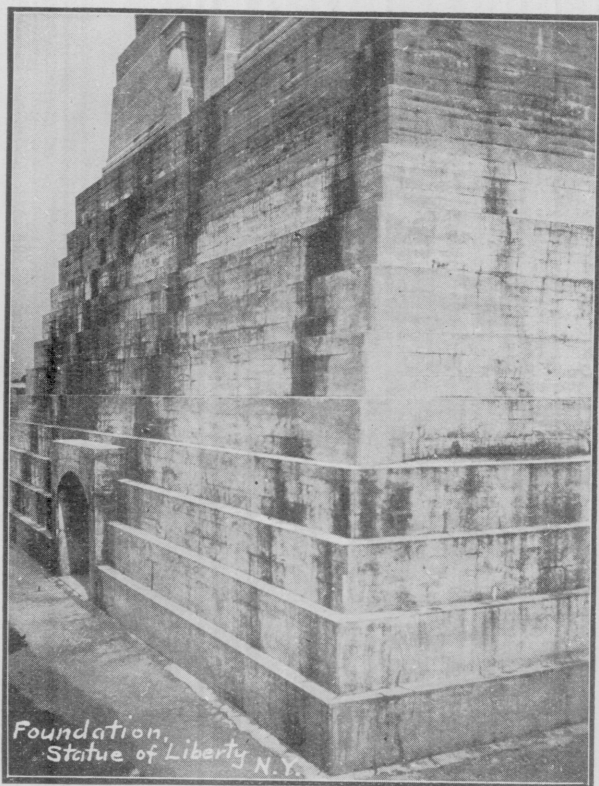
Concrete Foundation Statue of Liberty, New York Harbor.
